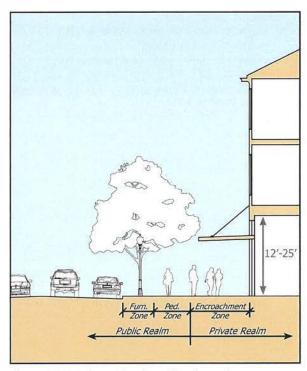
Cross Section, Shopfront Frontage (Illustrative)
